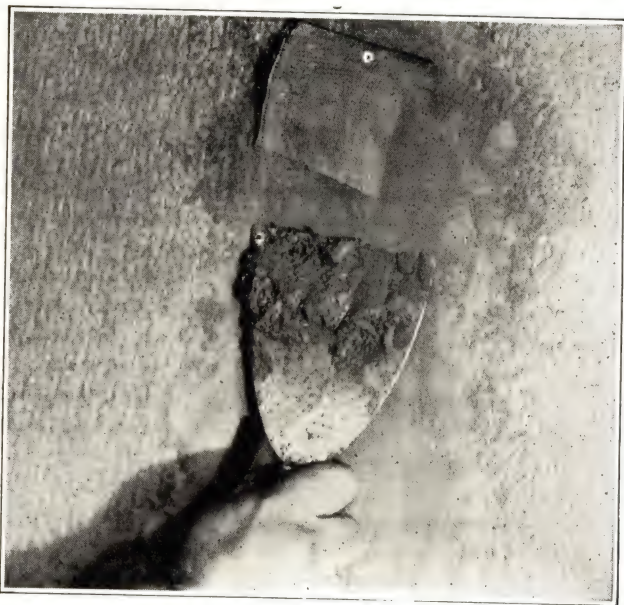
How joints in wall board are filled and reinforced with open mesh cloth tape to make them smooth and prevent cracked wall paper.
